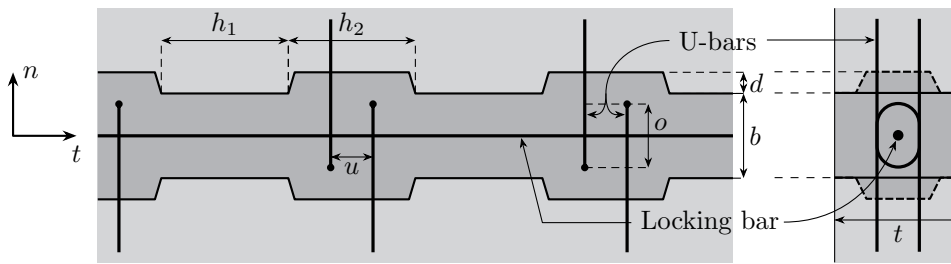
Elevation and cross section of the basic keyed joint reinforced with U-bar loops.
